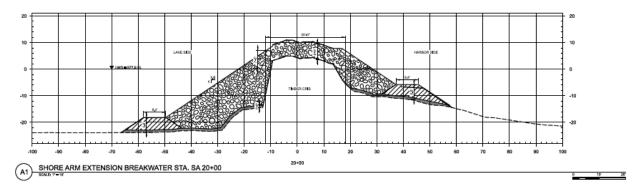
Cross-section showing intended rubble-mound encapsulation of existing timber crib and capstone structure.
